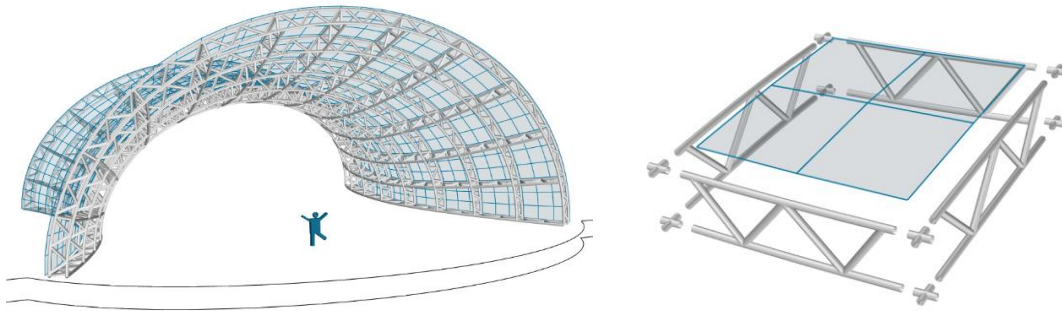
Temporary show venue with a demountable structure. Nodes are standard, truss members are circular, covering can be made with planar faces.
